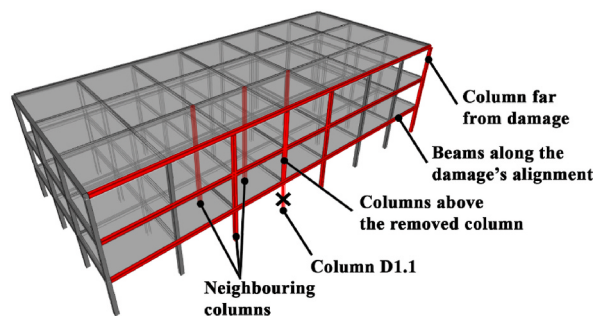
Elements analysed in Section 4.2: key structural elements most affected by the addition of perimeter roof-level retrofit beams for the removal of column D1.1.
